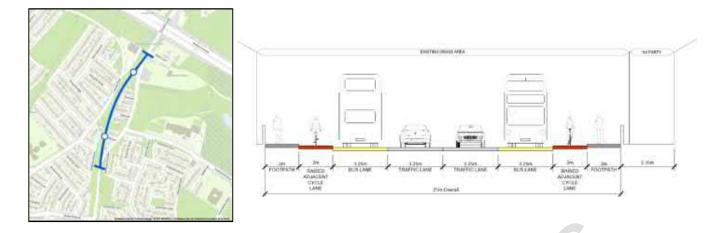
Existing EPR Routing at Park View and Typical Cross-Section (PV2).
